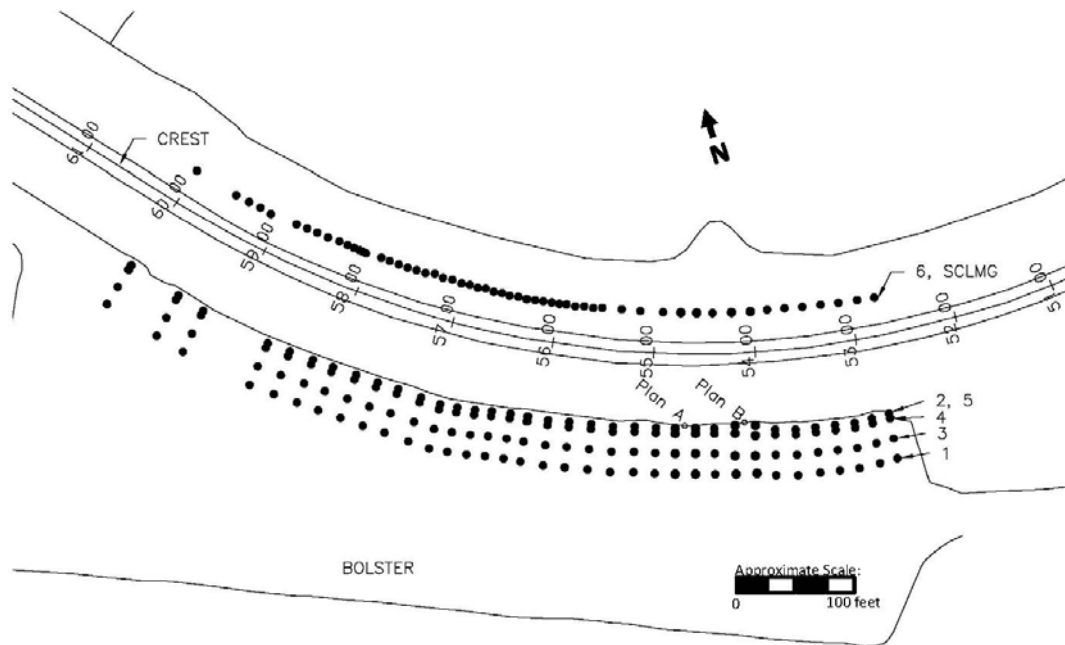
Final Plan of LMG Column Locations at Ground Surface as Constructed (Black Dots)
